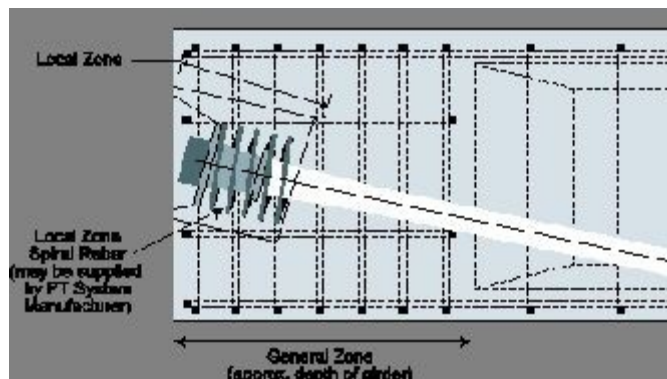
General and Local Anchor Zone in End of I-Girder
